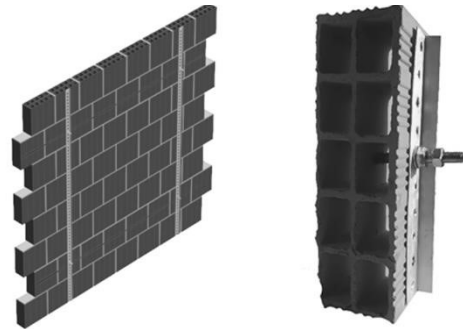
Positioning of the L-section aluminum profiles in the building external walls
